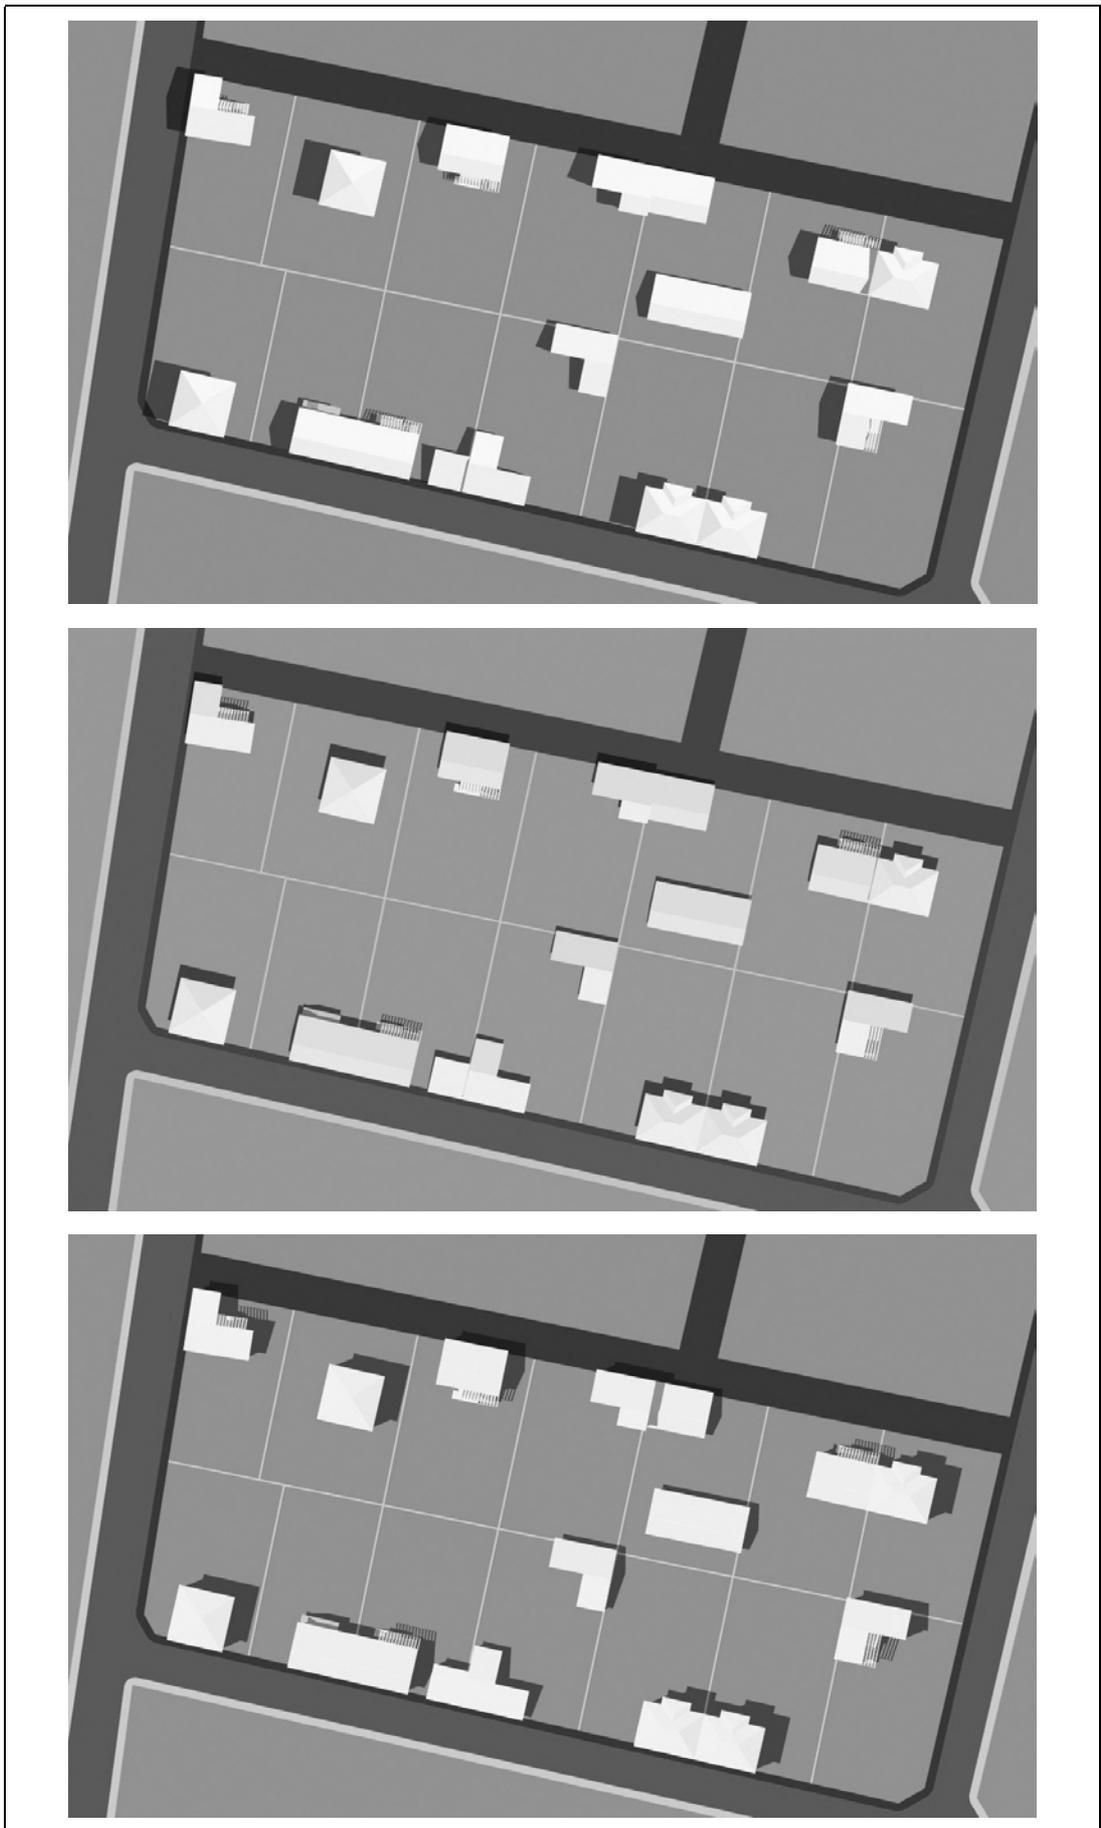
Top view of proposed site plan indicating the shading of each dwelling on 21st of June, at 10.00 am, 12.00 and 02.00 pm; Scale 1/1000
